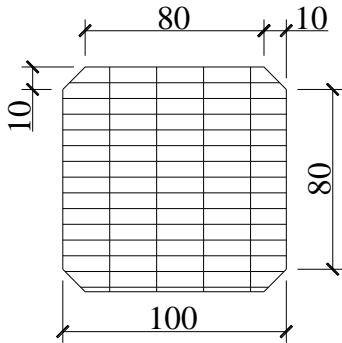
Cross section of LBL column and arrangement of bamboo laminates
